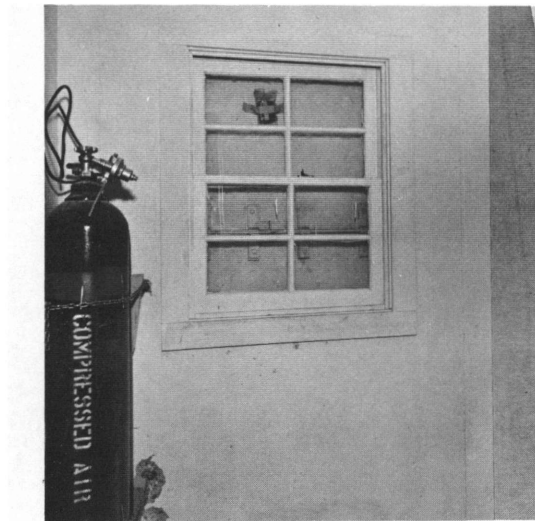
Interior of concrete bathroom shelter showing window detail.
